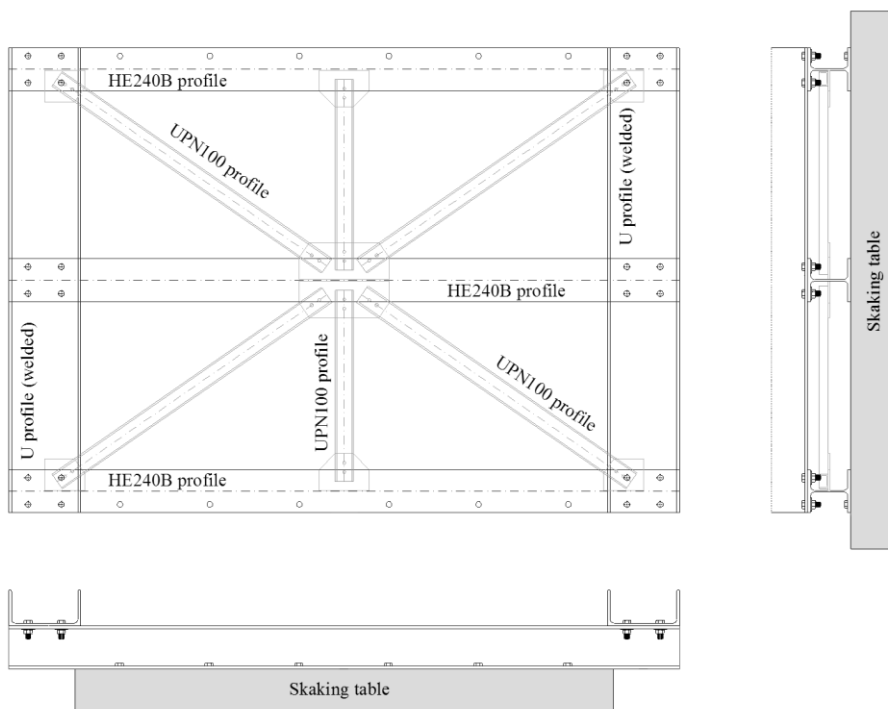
Geometry of the steel plane frame (plan and lateral view)
